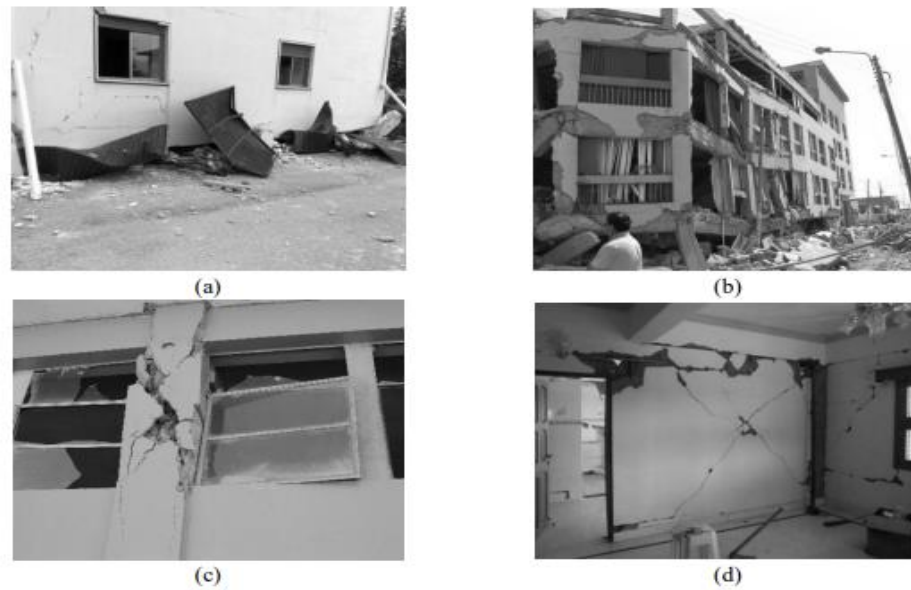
Failure of masonry wall and reinforced concrete frame
